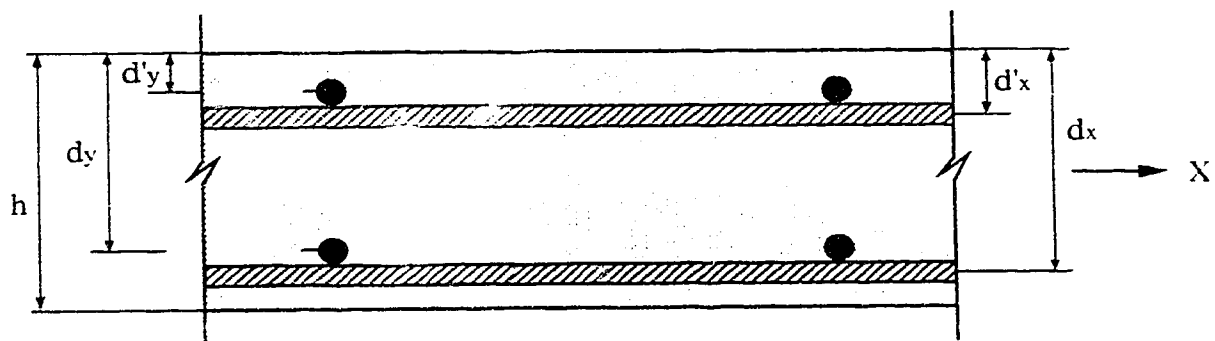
General Reinforcing Layout for a Typical Plate Section
